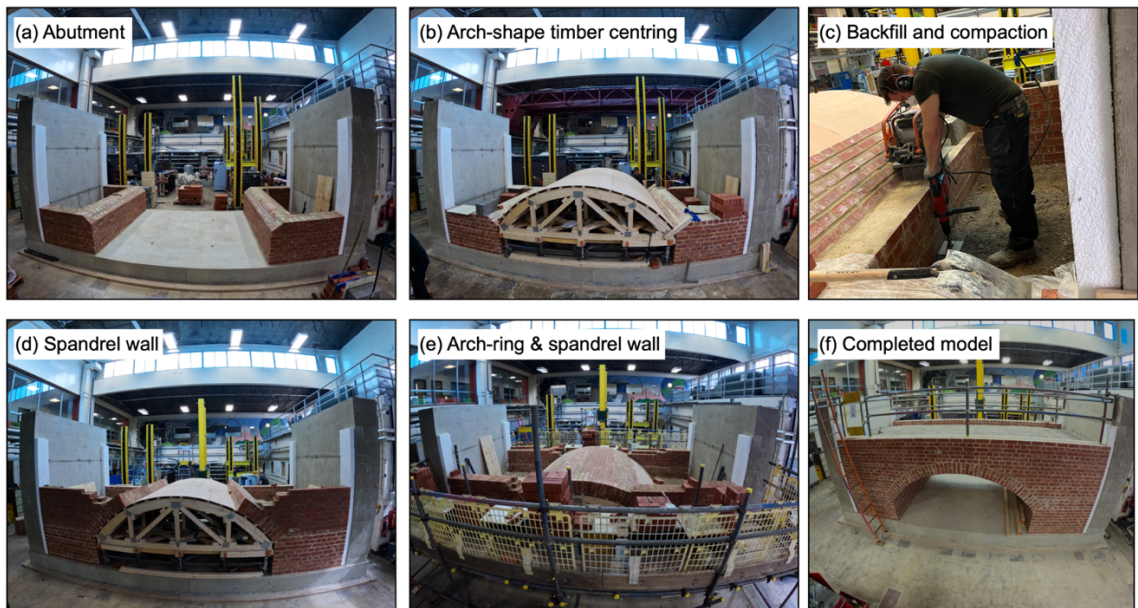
Construction process: (a) to (e) different construction stages; (f) completed masonry arch bridge.
